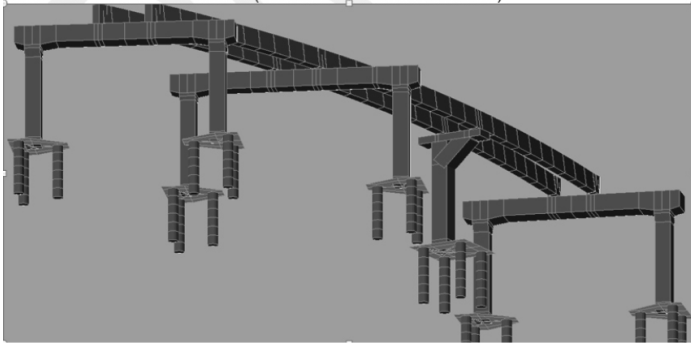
Model in Member Bridge Design Softwares for design of Integral Frame.
